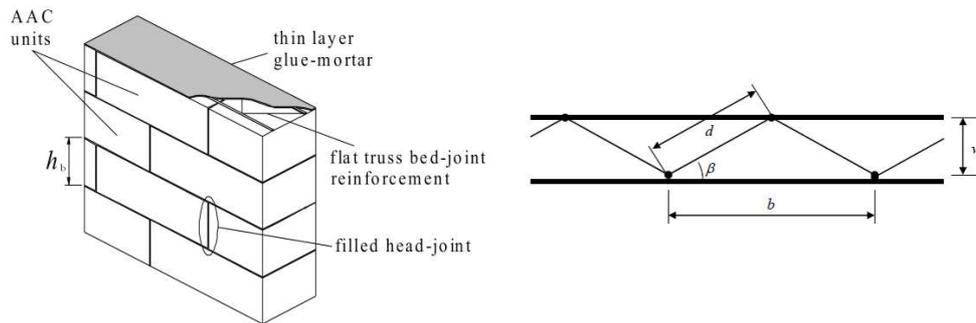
Truss type reinforcement placed in the horizontal bed-joint of a AAC masonry wall (left); truss type reinforcement with welded joints (right)
